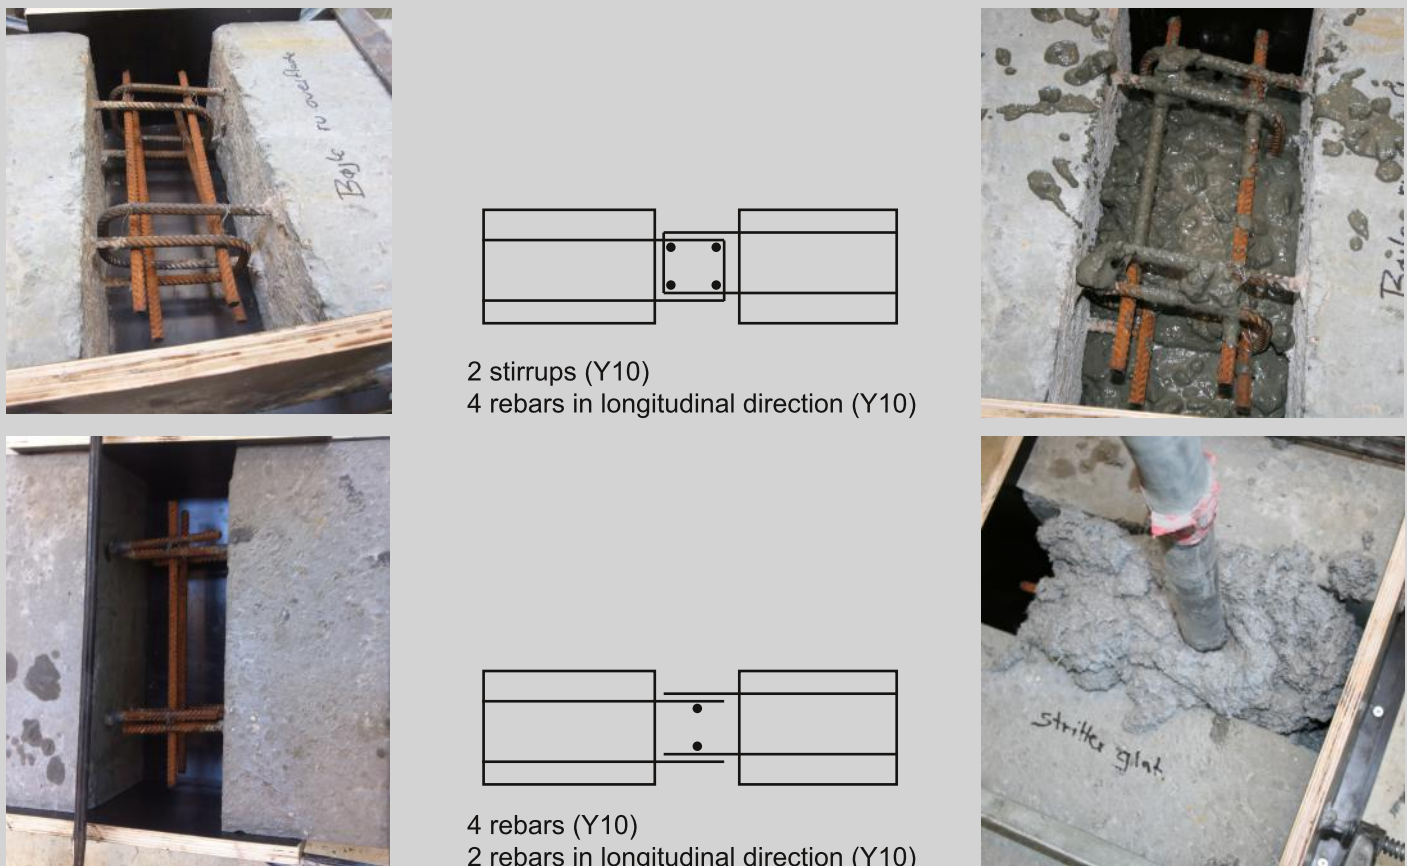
Reinforcement configurations applied for testing the mechanical performance of joints between precast concrete elements. Top: Traditional solution. Bottom: Alternative solution using high strength steel fibre reinforced concrete (JointCast).
